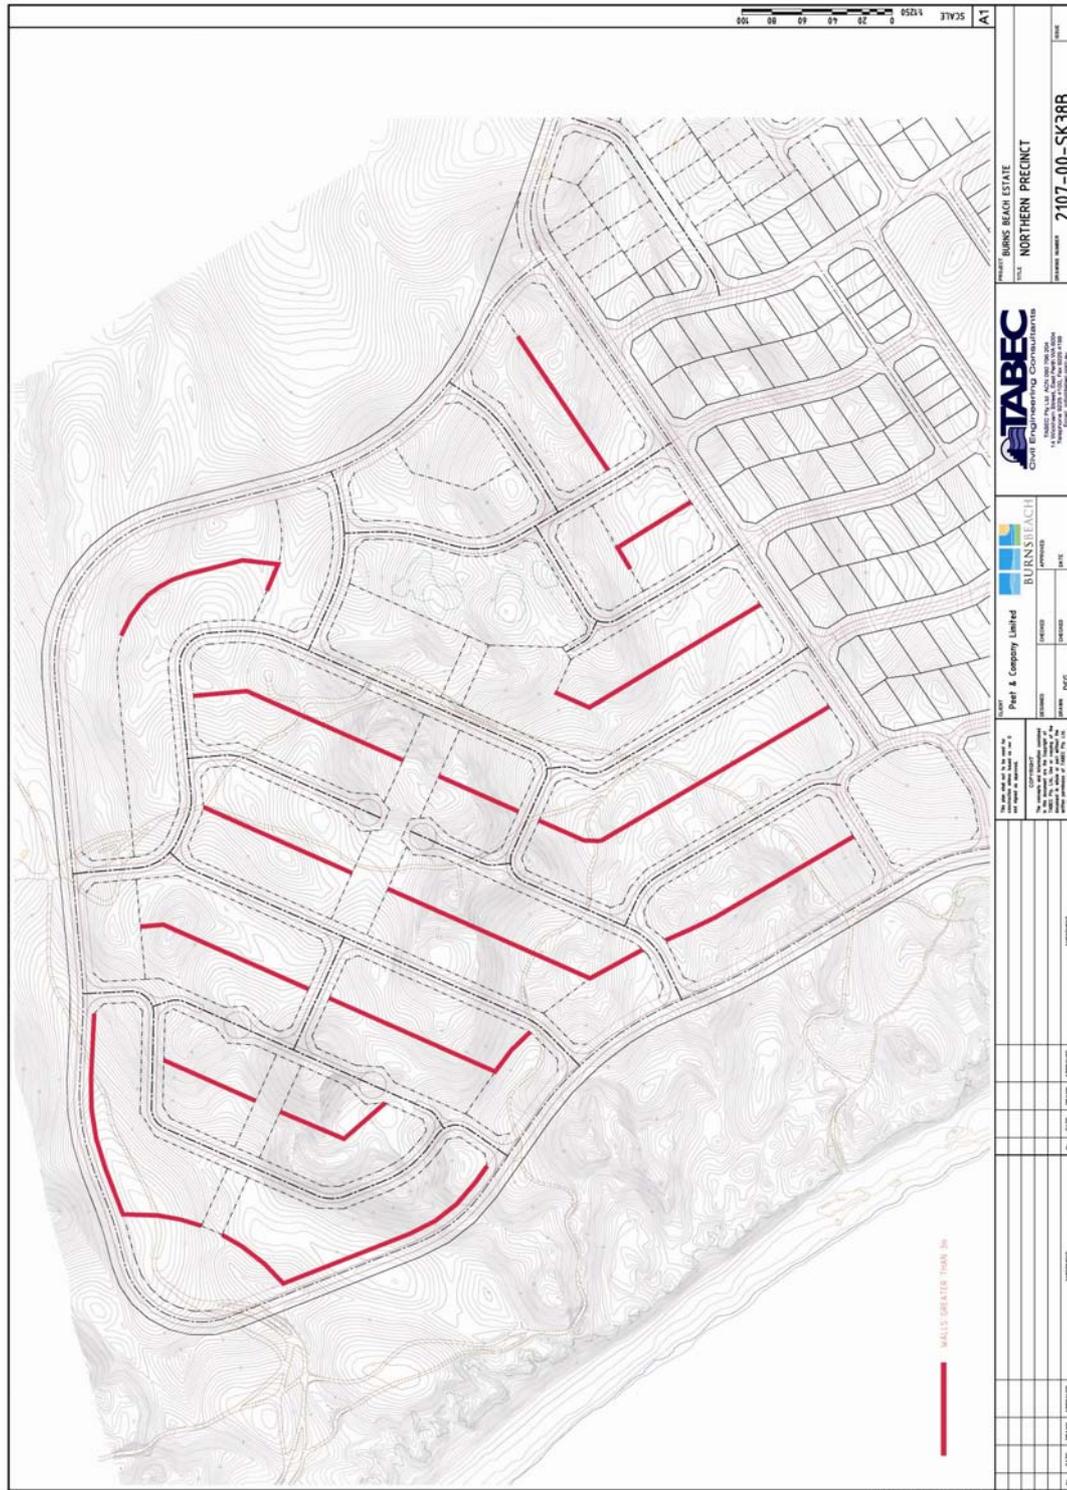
Retaining Walls Permitted to a Height of 4.0m
